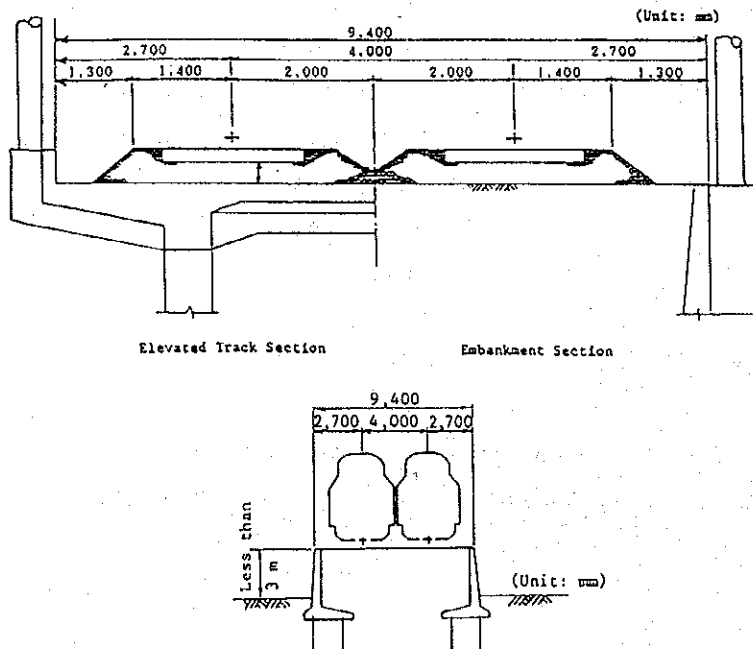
Standard Sections of Elevated Bridge and Side Wall Bank
